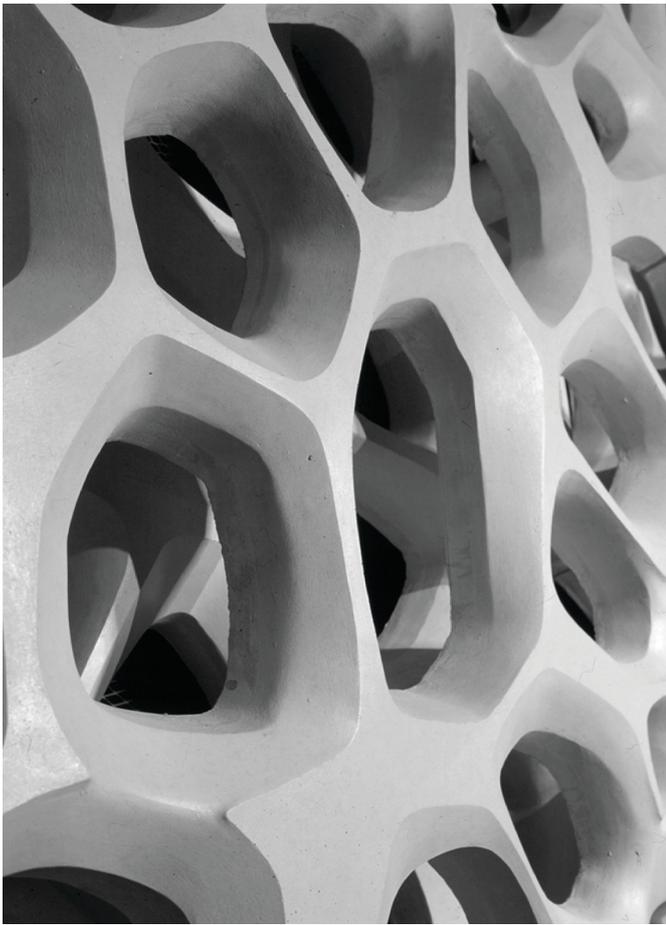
, "Cocoon Club", panellised concrete wall, design by 3deluxe, development of concrete elements by Villa Rocca
